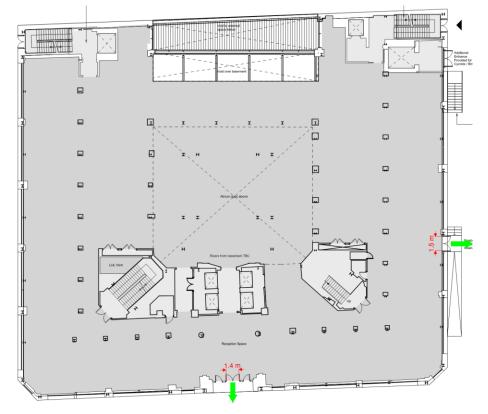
Ground Floor exits considered in the horizontal egress capacity assessment - final drawing still under development
